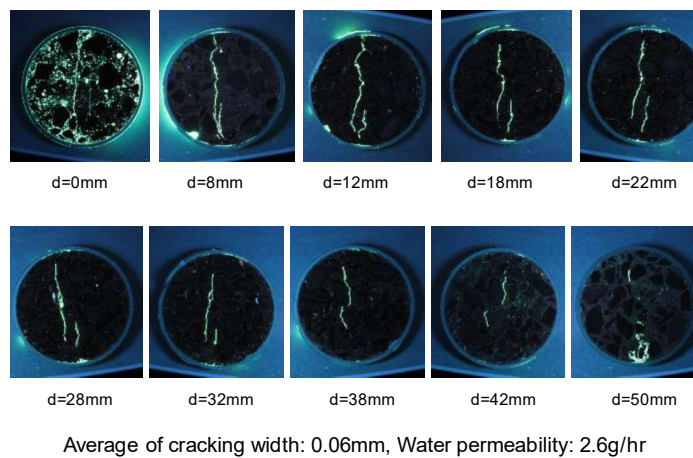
The cross section of concrete in which water can flow through at 2.6g/hr.
